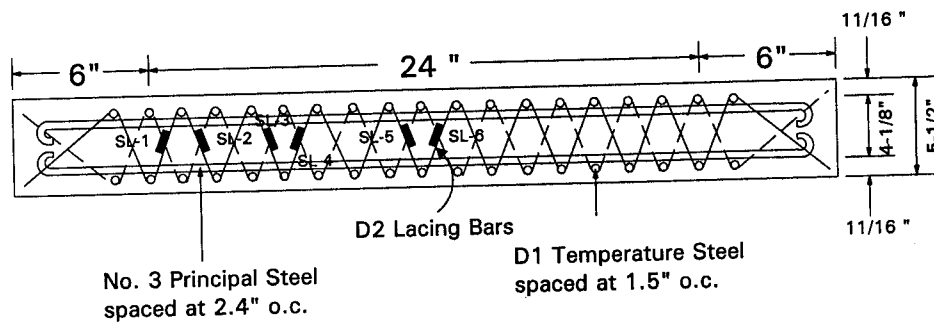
Strain Gage Locations on Stirrups in Slab No. 3
